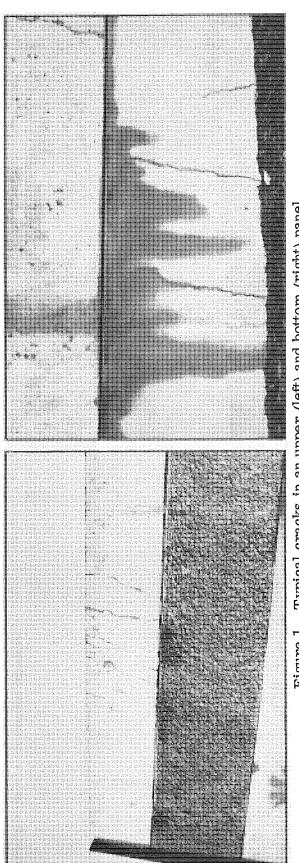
Typical cracks in an upper (left) and bottom (right) panel.
